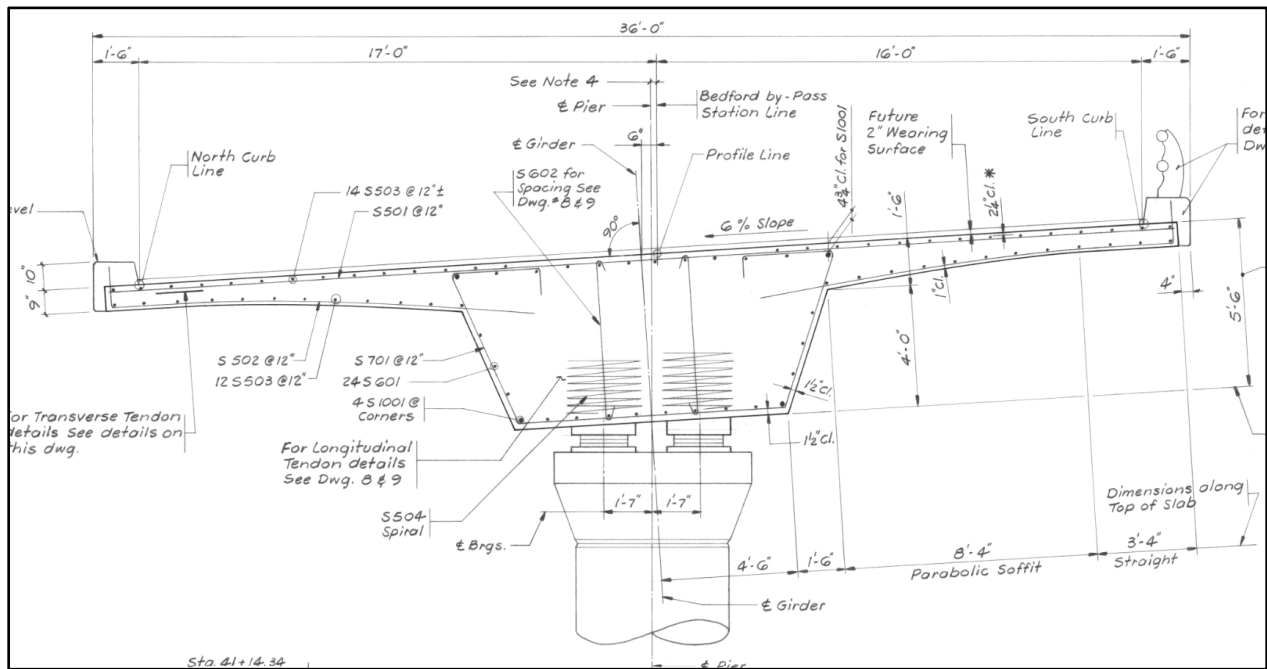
Bridge Structure Under Consideration Transverse Cross-Section
